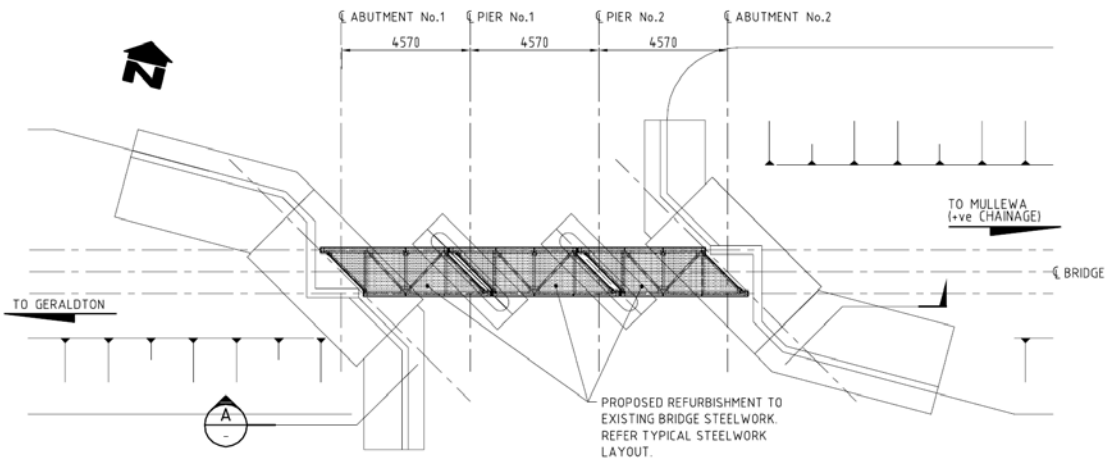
Plan view of rail bridge at CH103 (East-West alignment) indicating orientation of abutments and shallow foundations.
